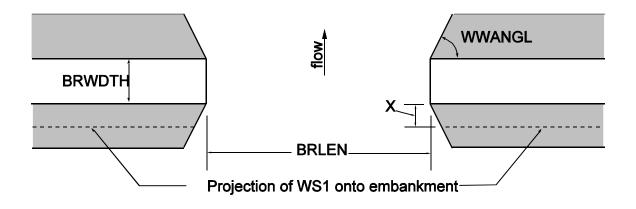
Definition sketch: type 4 bridge opening (BRTYPE = 4).
